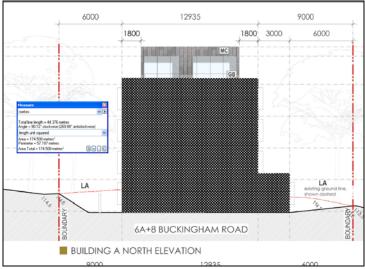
when measured from the finished ground level of the courtyard of apartment 4 the wall plane has an area of 174m2 before stepping back at the top floor level. This wall plane includes the open terrace on Level 2 and three balconies on Levels 3-5.
